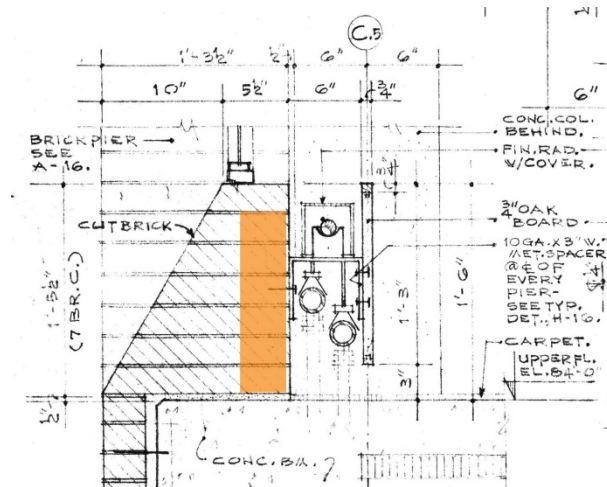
Section detail [From 1968 Drawing A-18, Detail V.]
